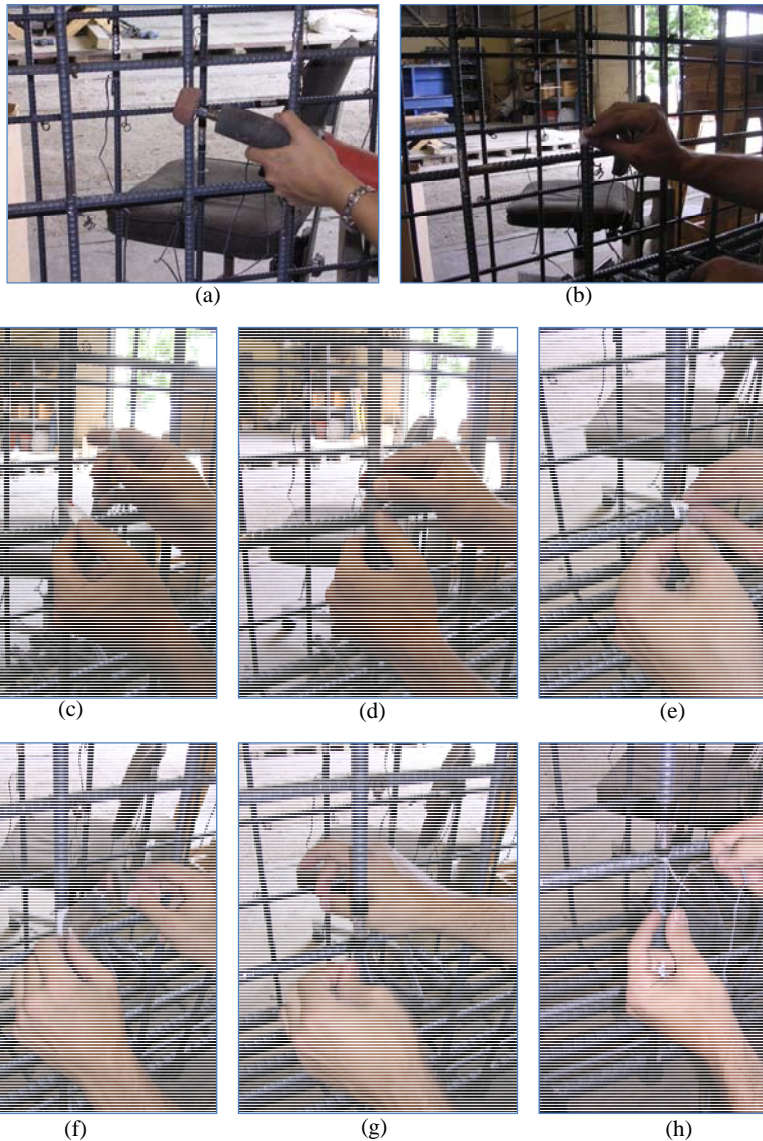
Installation of internal strain gages; (a) Deformations on reinforcement bar grinded off using a die grinder, (b) smooth surface cleaned using acetone, (c) adhesive used in attachment of gage, (d) pressure applied to the gage to ensure proper setting of adhesive, (e) putty tape applied between the entering wires and the reinforcement bar, (f) foil tape placed over the puttied gage, (g) electrical tape used to seal the ends, (h) slack provided in the wire
